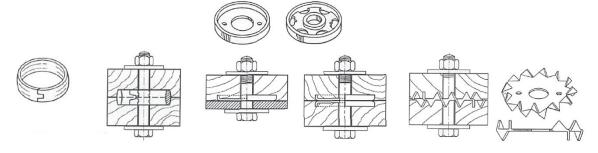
Split-ring connector [9] Figure 2.40: Shear-plate connector [9] Figure 2.39: Toothed-plate connector [9]
